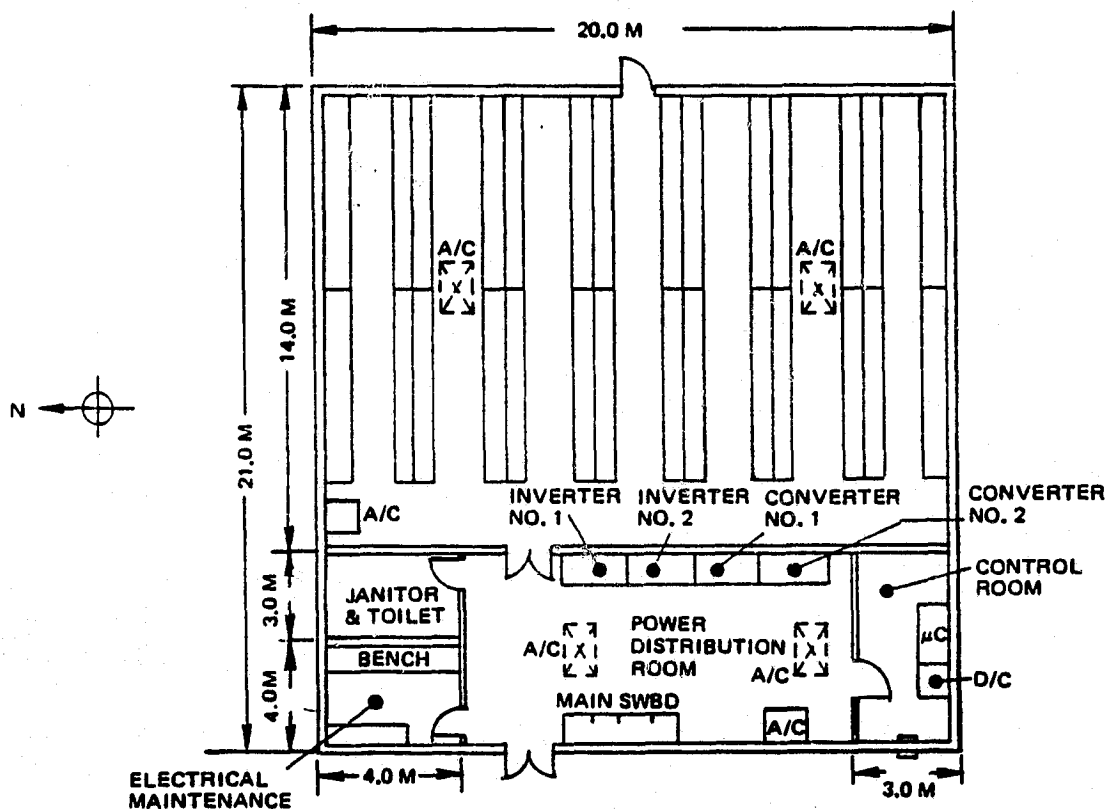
CONTROL BUILDING FLOOR PLAN INCLUDING BATTERY STORAGE (0.4 ACF)
